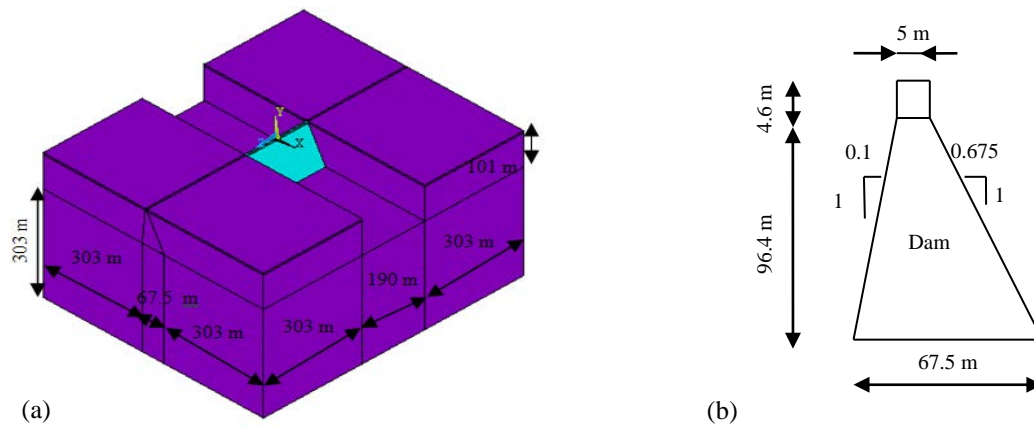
Oued Fodda dam-foundation rock system dimensions: (a) dam-foundation rock system; and (b) dam body
